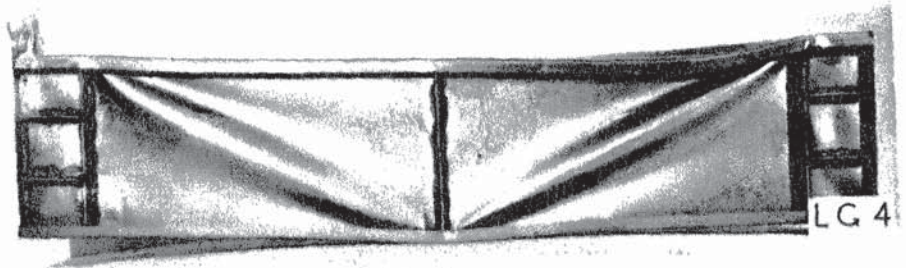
GIRDER LG4 AFTER FAILURE
